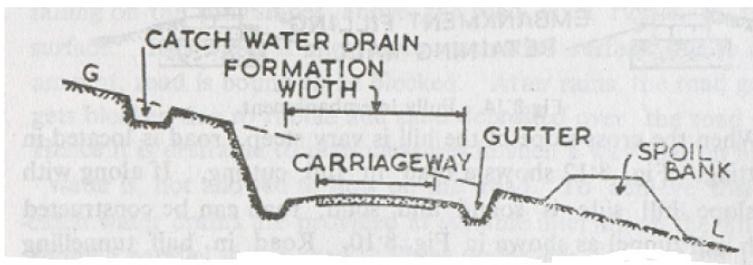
Proposed road template road passing through sloped hilly area section; sketch Singh and Singh (2001, 237)
